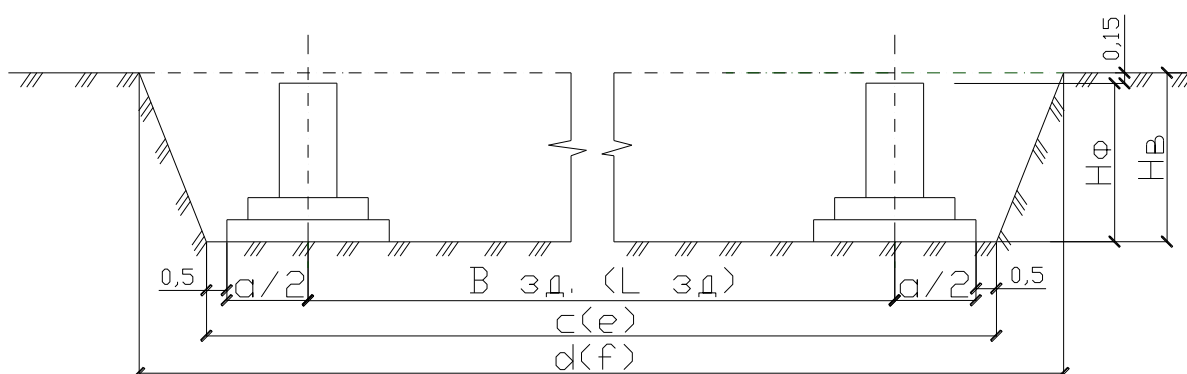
Determining the volume of the excavation (pit) for the building.
